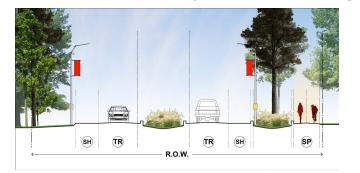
East-West Parkway, New Road Alignments – Proposed
